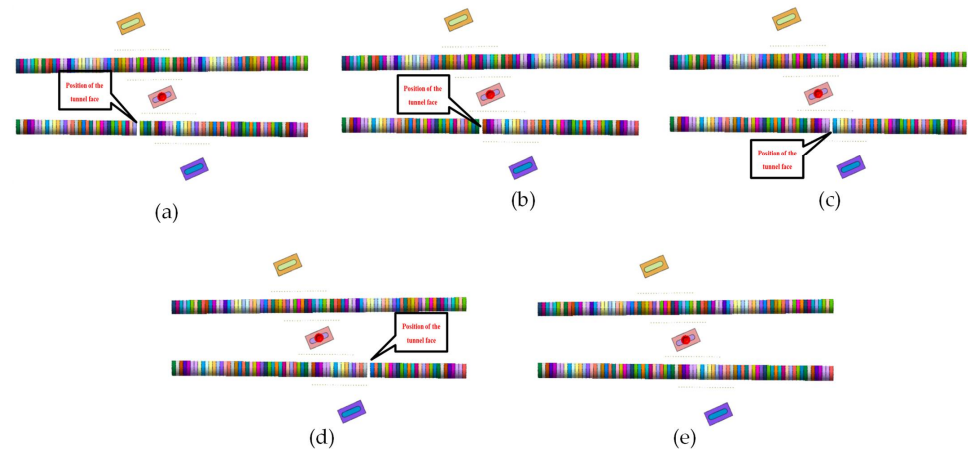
For the right line of the interval: (a) excavation advances to starting point of isolation piles; (b) excavation advances to the nearest point of the bridge foundation; (c) excavation underneath the bridge; (d) excavation advances to ending point of isolation piles; (e) completion of the construction.
